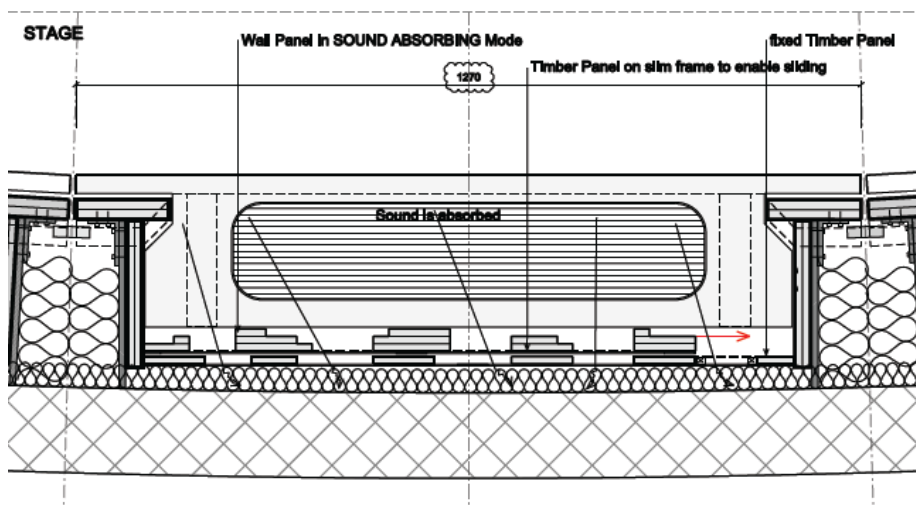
Plan of sliding slat arrangement on platform surround (absorbing mode)
